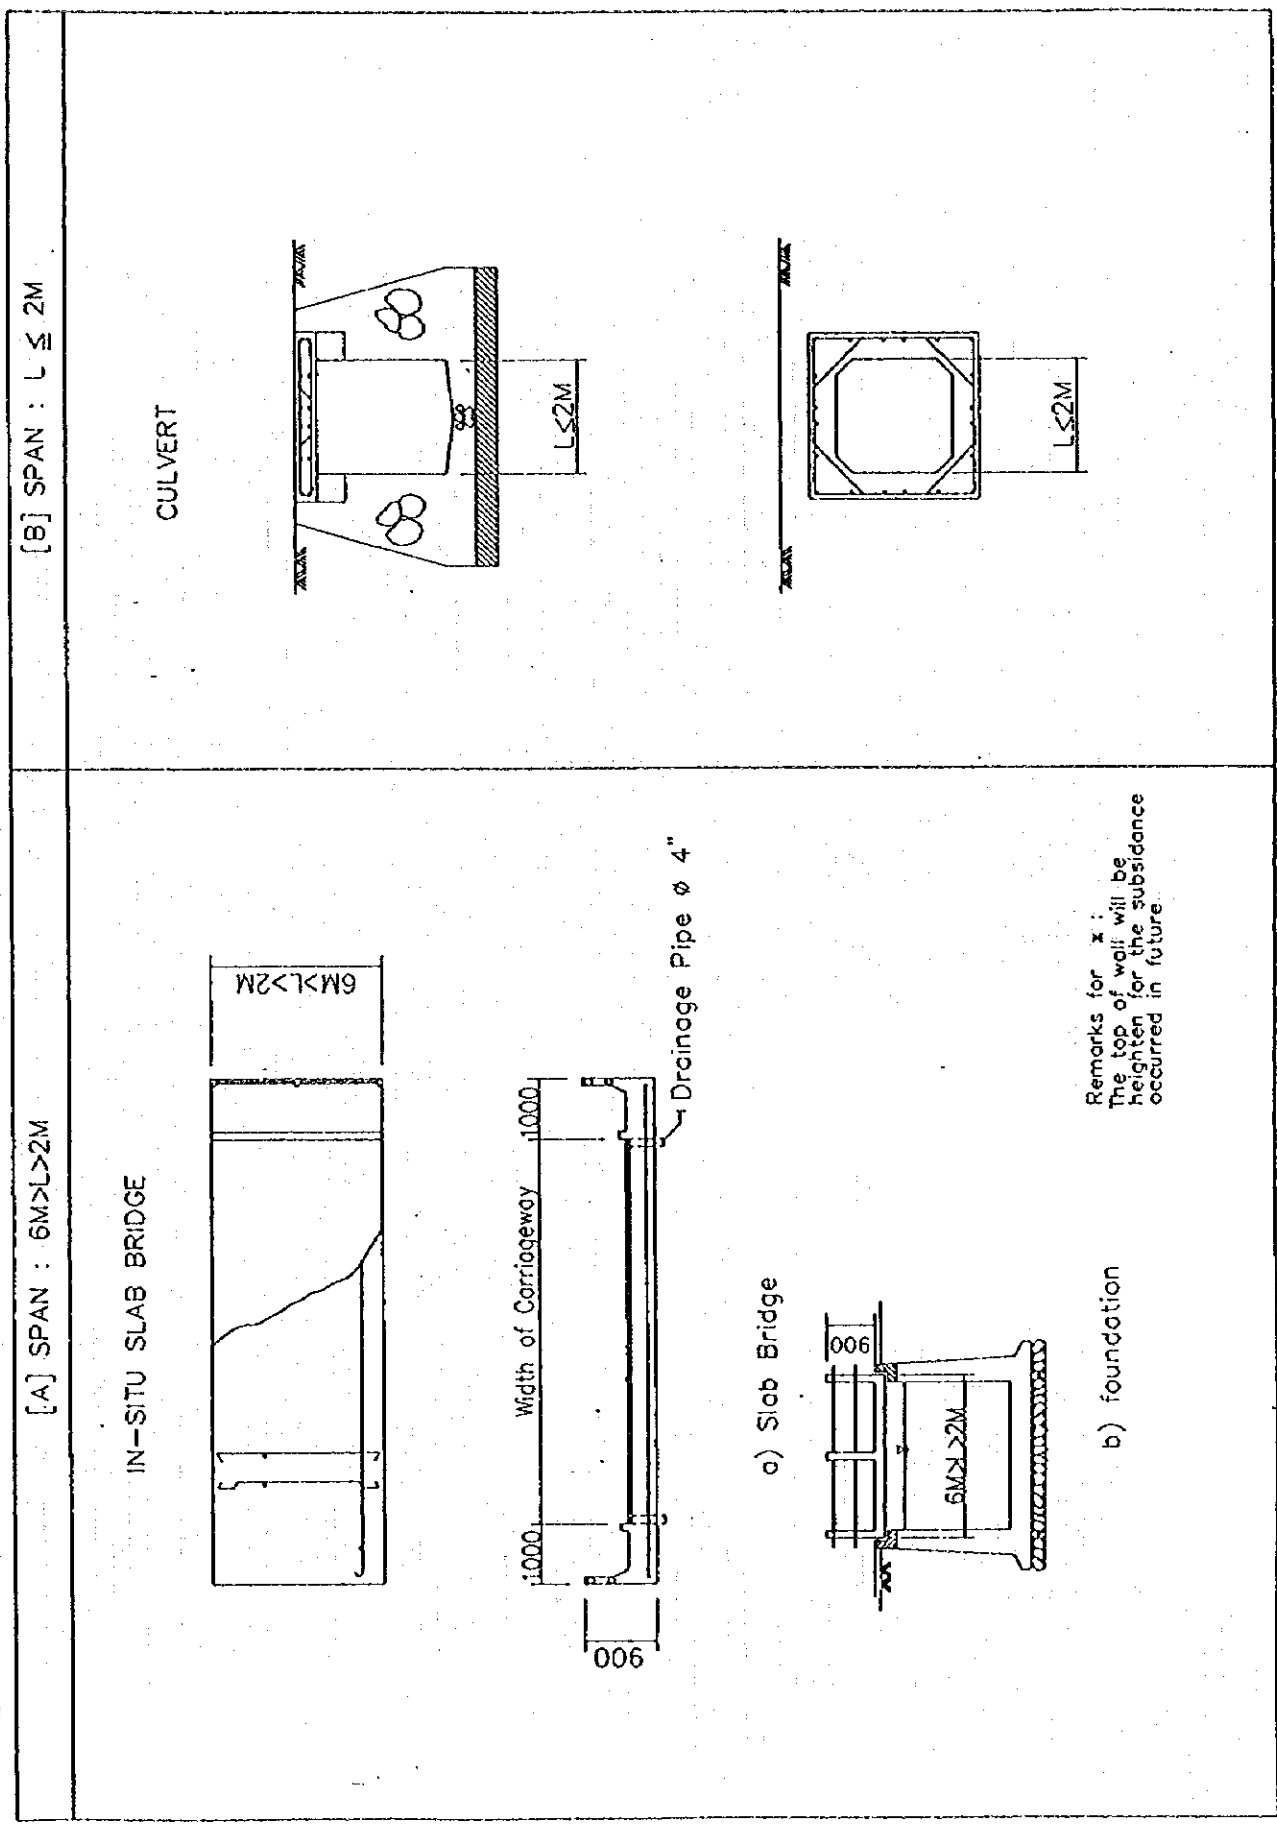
Typical Section of In-Situ Slab Bridge and Culvert
